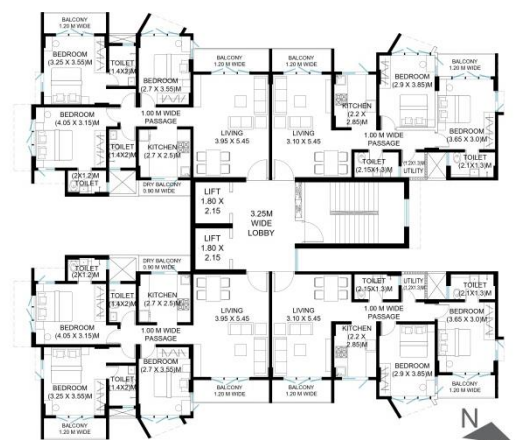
UNIT PLAN SHOWING CROSS VENTILATION
